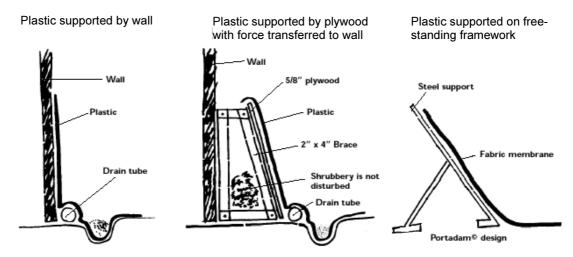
Methods of using and supporting plastic sheeting to limit floodwater entry into a building (source LSU 2000)
